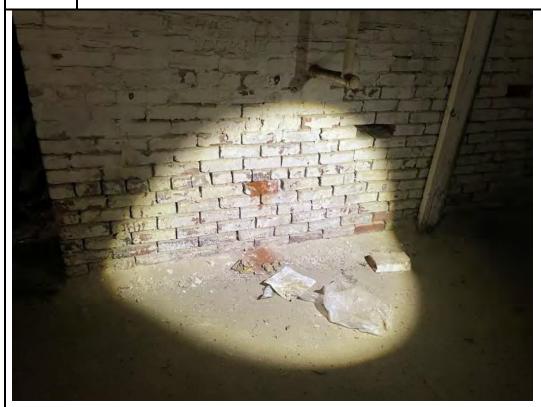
PHOTO # COMMENTS: A typical basement wall surface with extreme brick and mortar deterioration. Note the 'Red Dust' piled at the bottom of the wall. Evidence of a very long term condition beyond repair.
